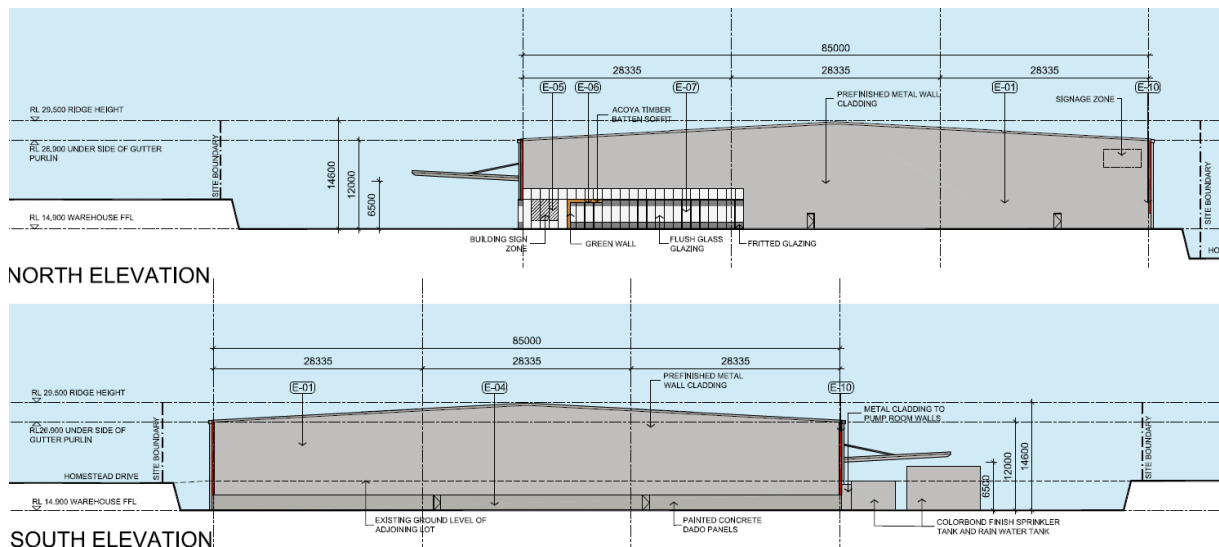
Proposed east and north and south elevation (Source: Frasers Property)
